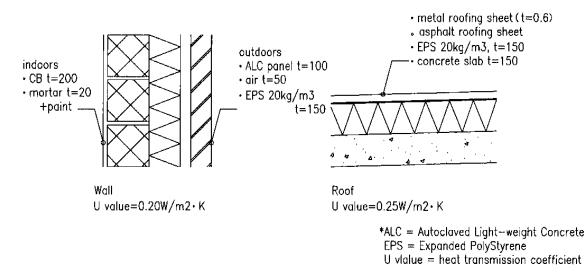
Heat Insulation Specifications for Roofs and External Walls
